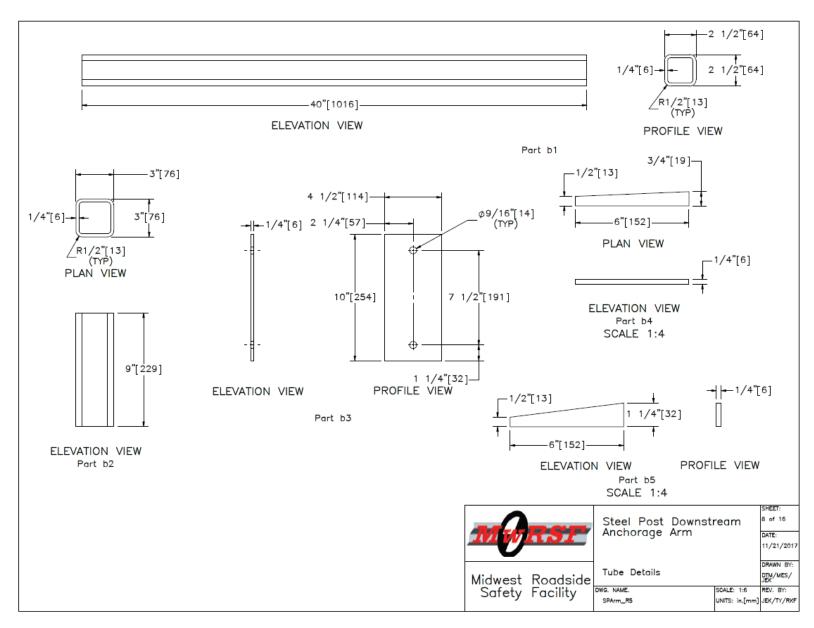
T-Shaped, Breaker Bar Design – Tube Details
